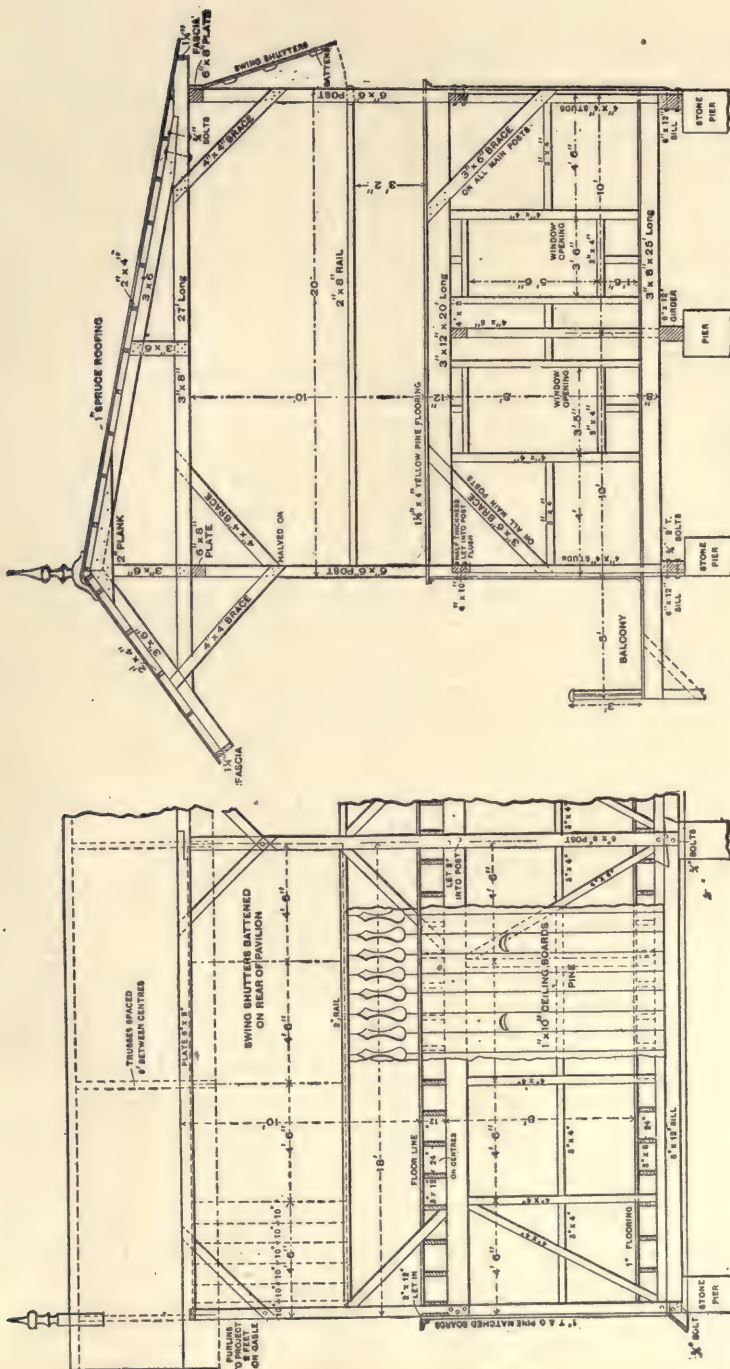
Transverse Section of the Pavilion, Showing End Framing.
